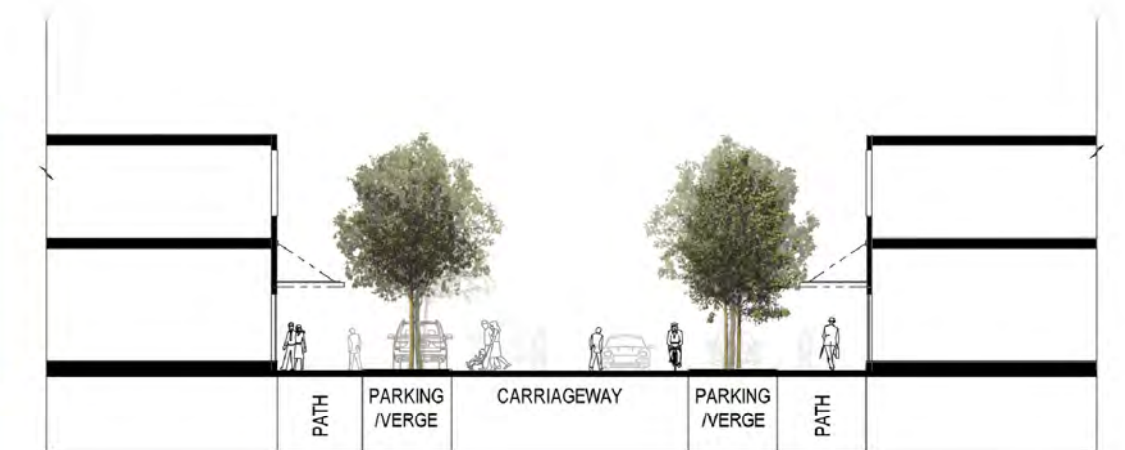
Section BB – Indicative section through Campbell Street neighbourhood centre
